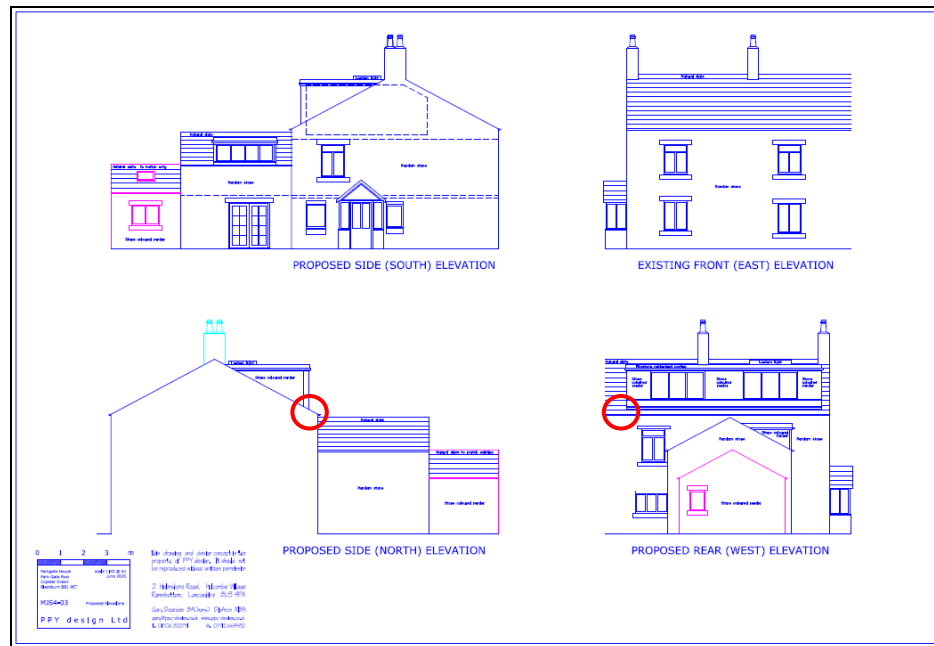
Proposed location of new roost access (adapted ©PPY Design)
